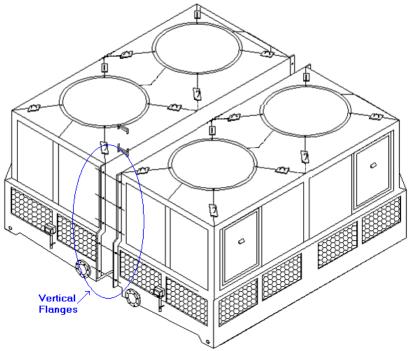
Tower Sections 1 & 2 Installation for a Quadruple Fan Tower
